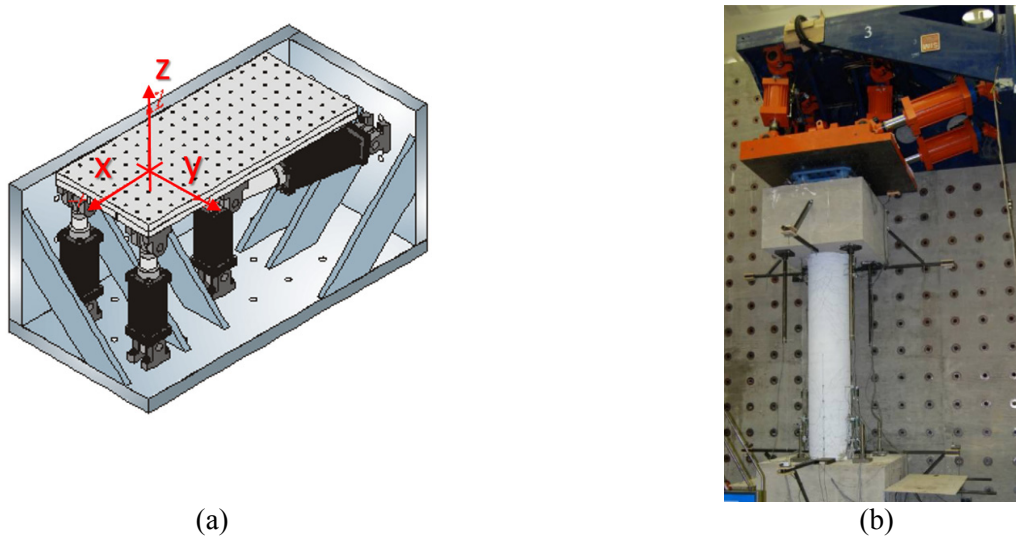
LBCB: (a) schematic of the loading platform; (b) testing of a column specimen.
